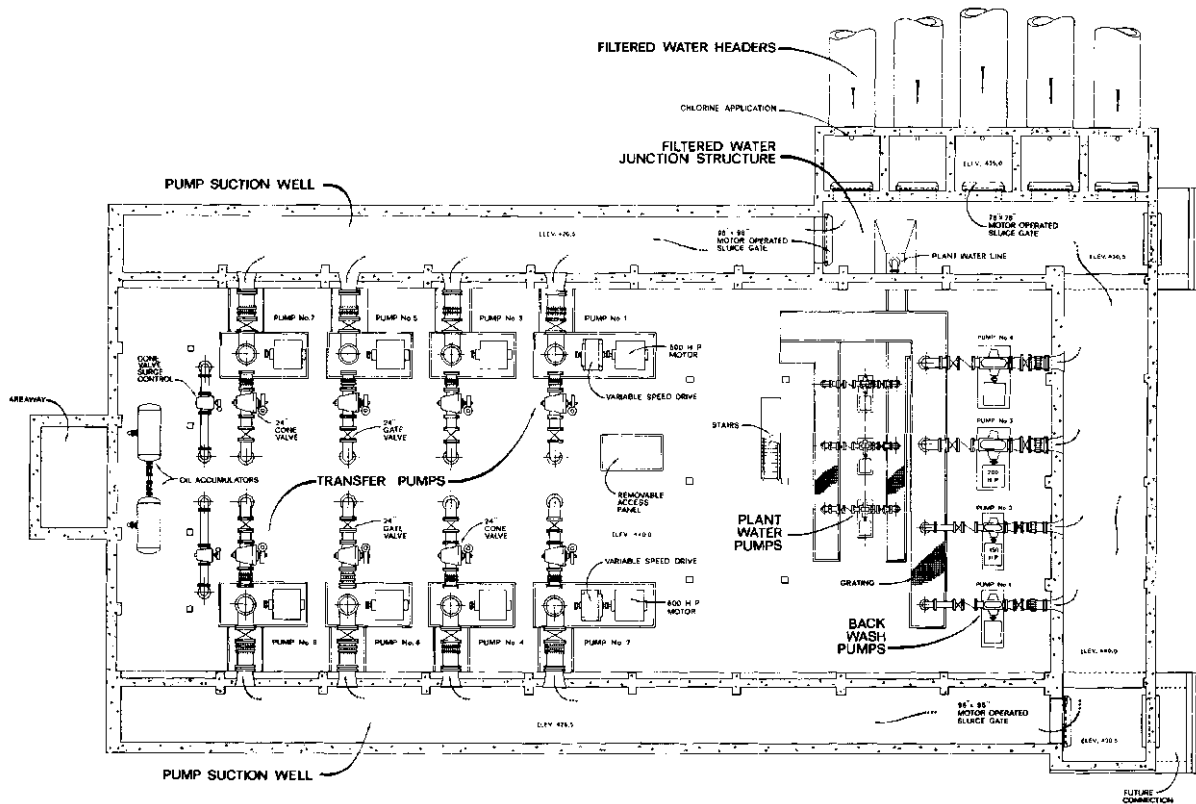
Plan of the high-service pumping station in the East Side water treatment plant, Dallas (1 in = 2.54 cm; 1 ft 0.3048 m) (URS/Forrest and Cotton)
